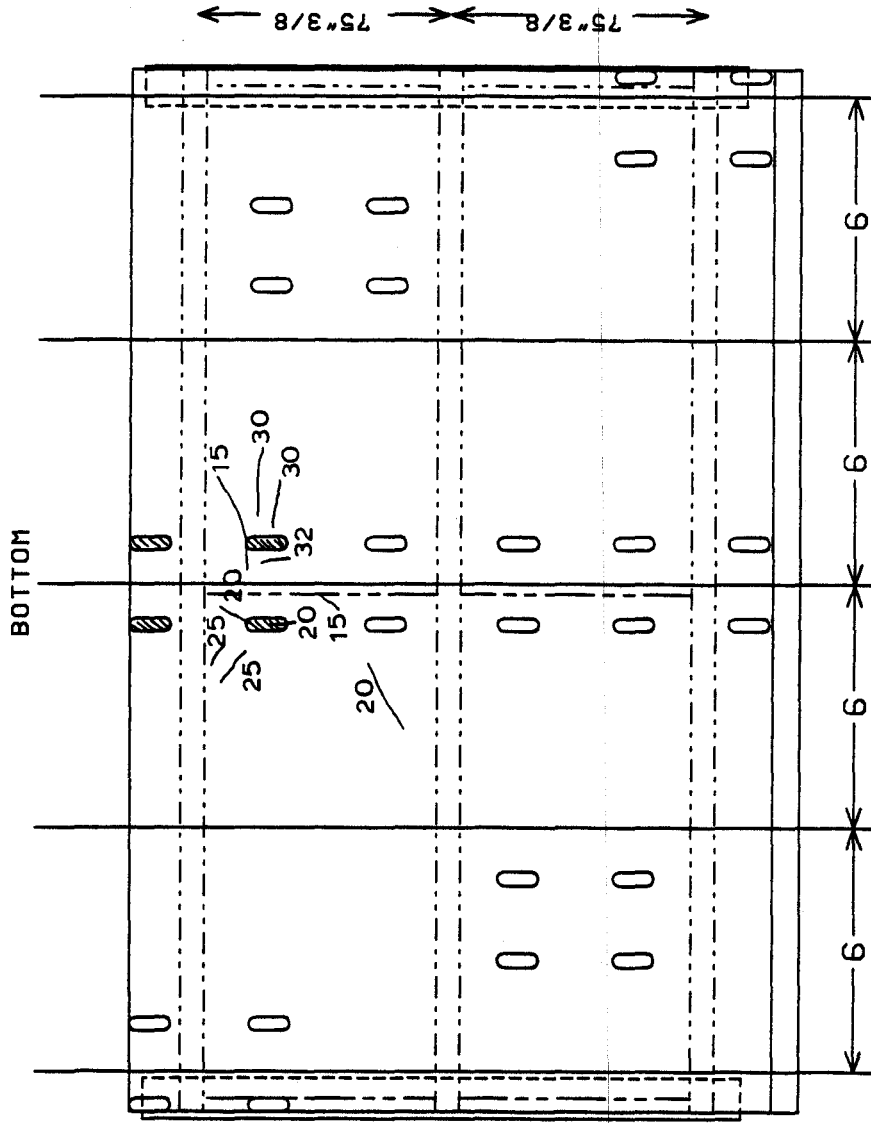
Bottom Cracking Pattern (Second Bridge - Test No. 2)
